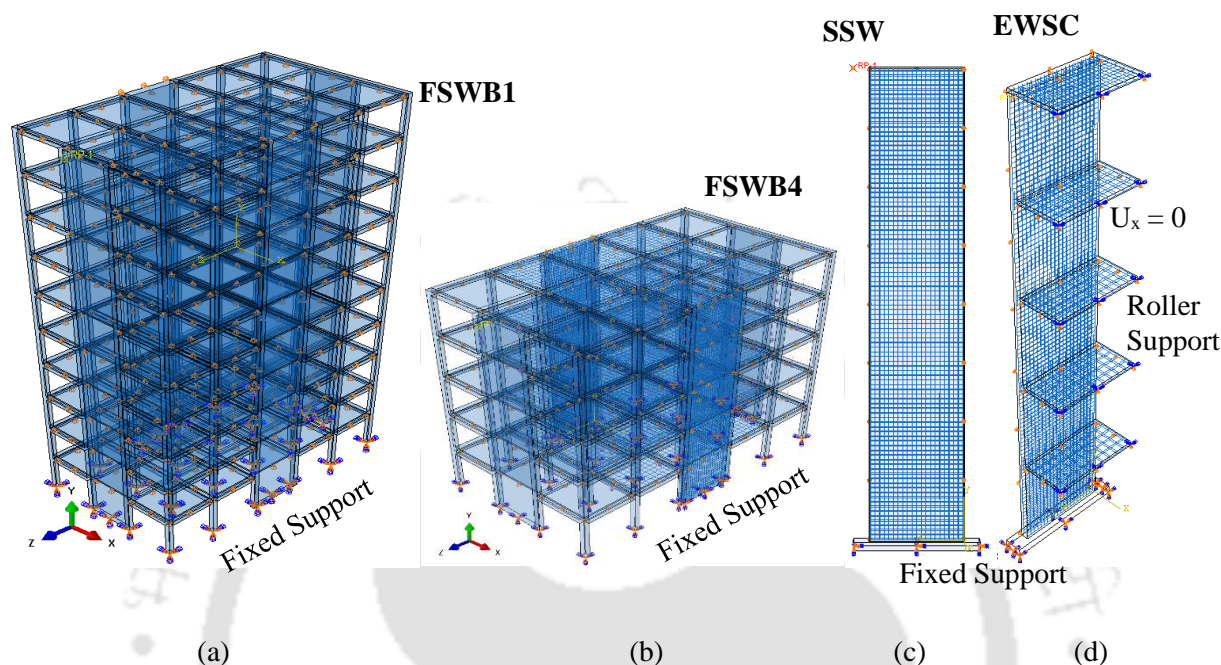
Geometry and boundary conditions of specimens used for pushover analysis: (a) ten storied building; (b) five storied building; (c) isolated slender wall and (d) exterior wall-slab assemblage.
